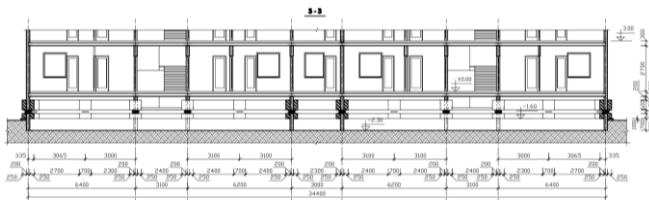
Plan of location of HDRBs and BNHS in the seismic isolation interface of existing 9-story large-panel apartment building
